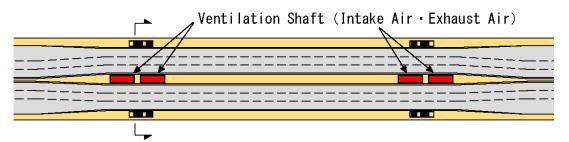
Road width after the Construction of Mirpur 14 Station (Plan)
